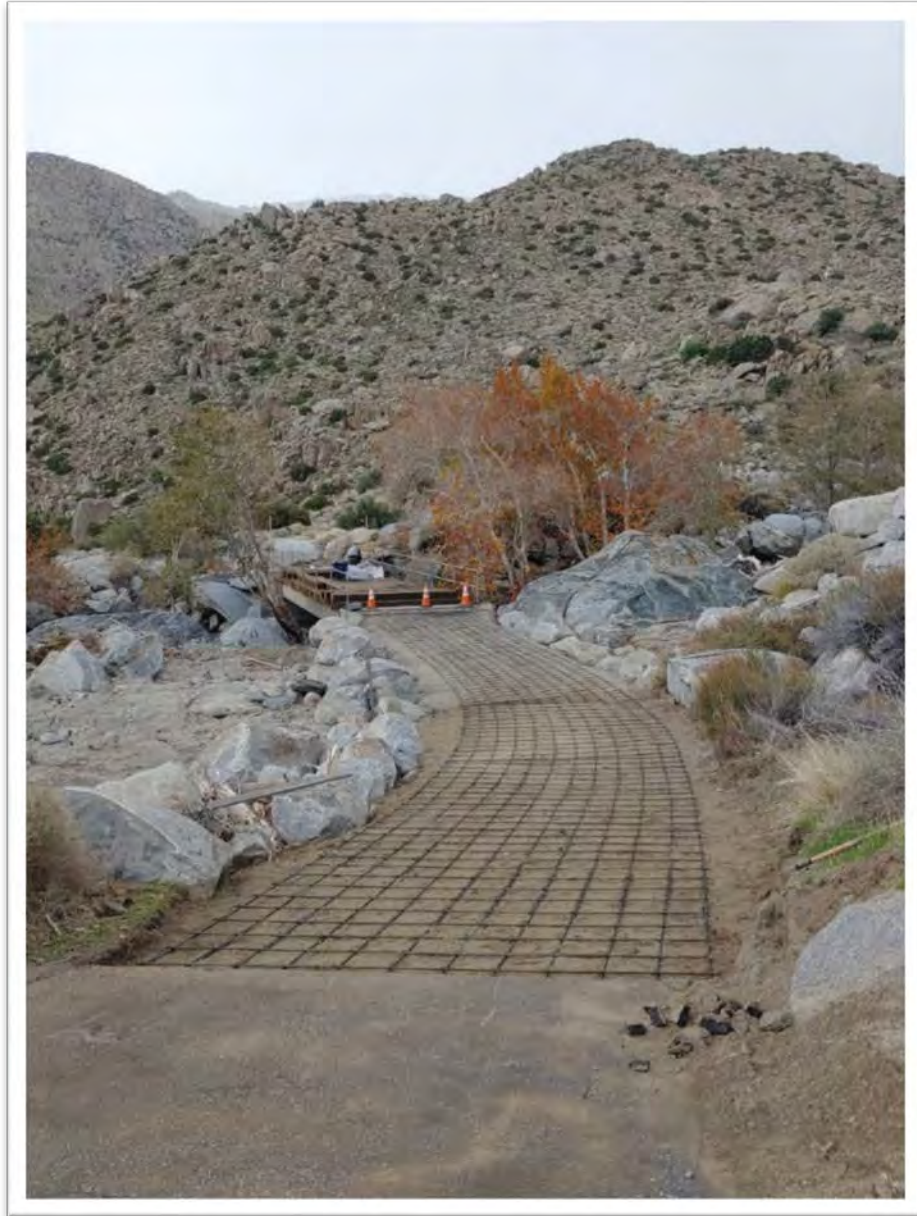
The west approach to the Falls Creek Bridge mid-construction.
